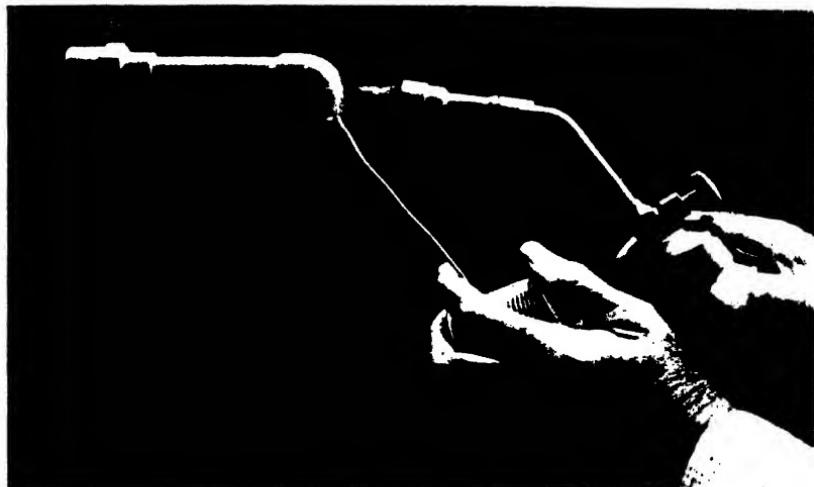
The tube and fitting, being properly fluxed, are assembled and heated to the correct soldering temperature by playing the torch on the fitting and the tube adjacent thereto. Then solder is applied at the edge of the fitting and, melting, flows by capillary action into the space between the tube and fitting.
